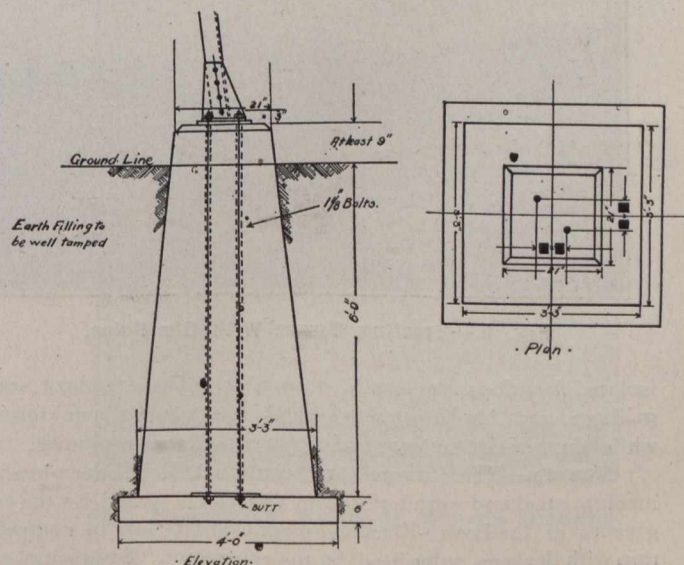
Concrete Footings for Heavy Anchor Tower.
